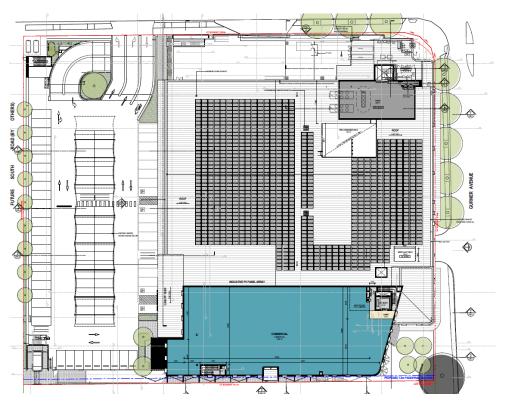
Level 1 Floor Plan prepared by Clarke Hopkins Clarke
